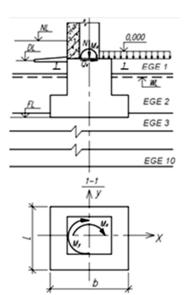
shows the design diagram of a single columnar foundation in the stratum of a multilayer soil foundation. The foundation and base operate jointly under the action of loads N_{II} , M_{IIx} , Q_{IIx} , M_{IIy} , Q_{IIy} , indicated in the diagram, to which the above-ground part of the building is exposed.
